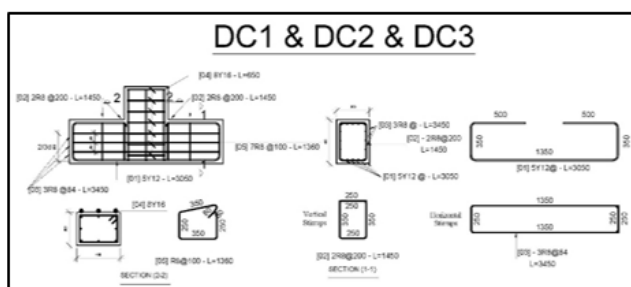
Reinforcement details of corbels DC1, DC2 and DC3
